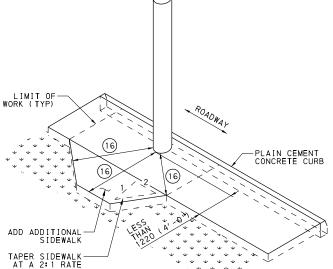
DETAIL ILLUSTRATES A TYPE 1 EXISTING RAMP REPLACED WITH A TYPE 2 RAMP. USE THIS DETAIL AS AN EXAMPLE TO REPLACE ANY RAMP WITH A DIFFERENT CURB RAMP TYPE.
